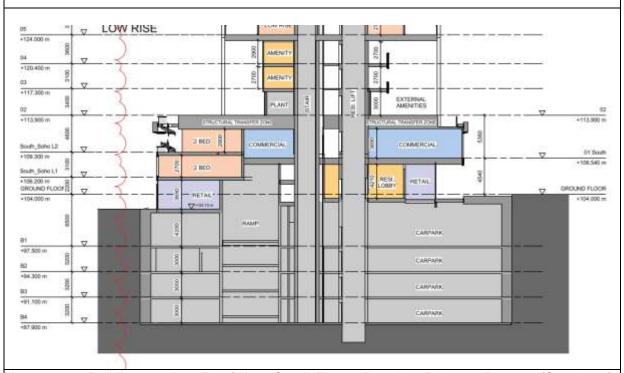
Building section East/West South-Tower Drawing DA2101 Rev 02 (Section 1) depicts the level change between Anderson Street and the laneway at the rear.
